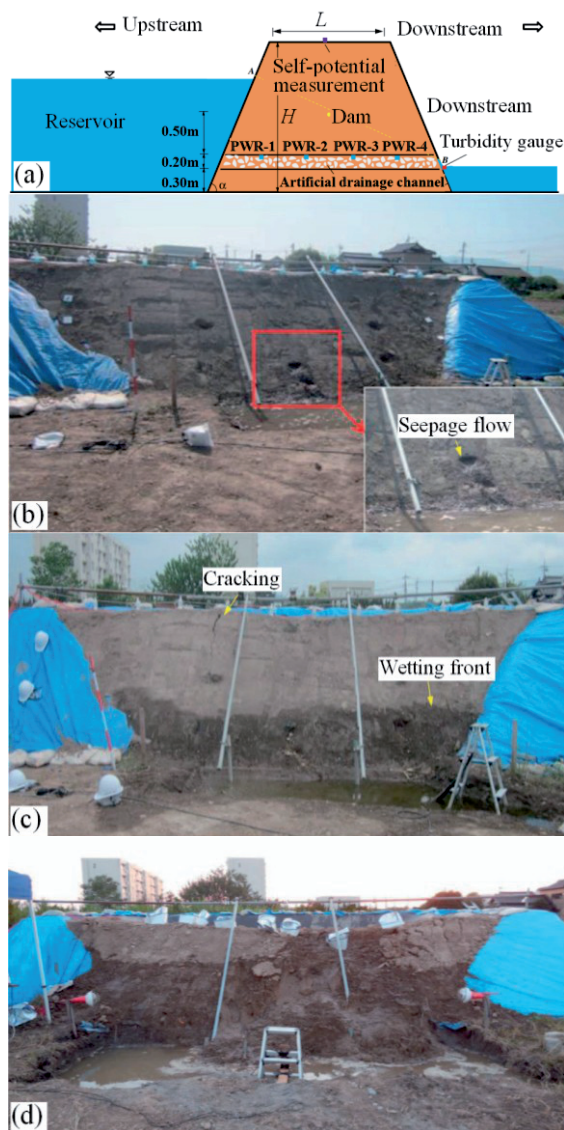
Field test of seepage failure of landslide dam [11]: a) longitudinal section, b) seepage water at the downstream face, c) emergence and evolution of cracks on the dam crest, and d) settlement of the dam crest and sudden collapse of the dam body.
